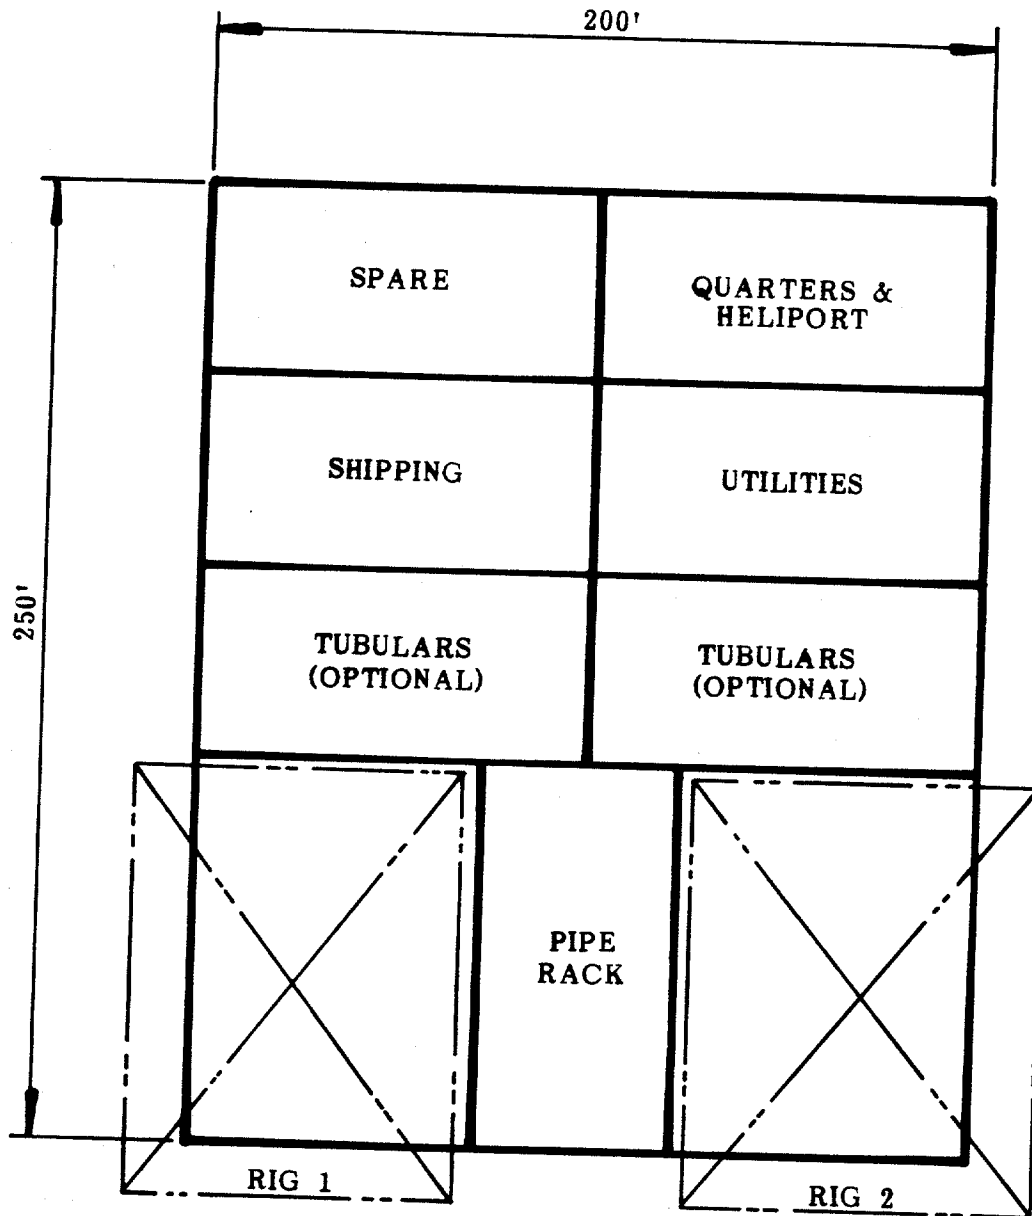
LEVEL 3 DECK LAYOUT
